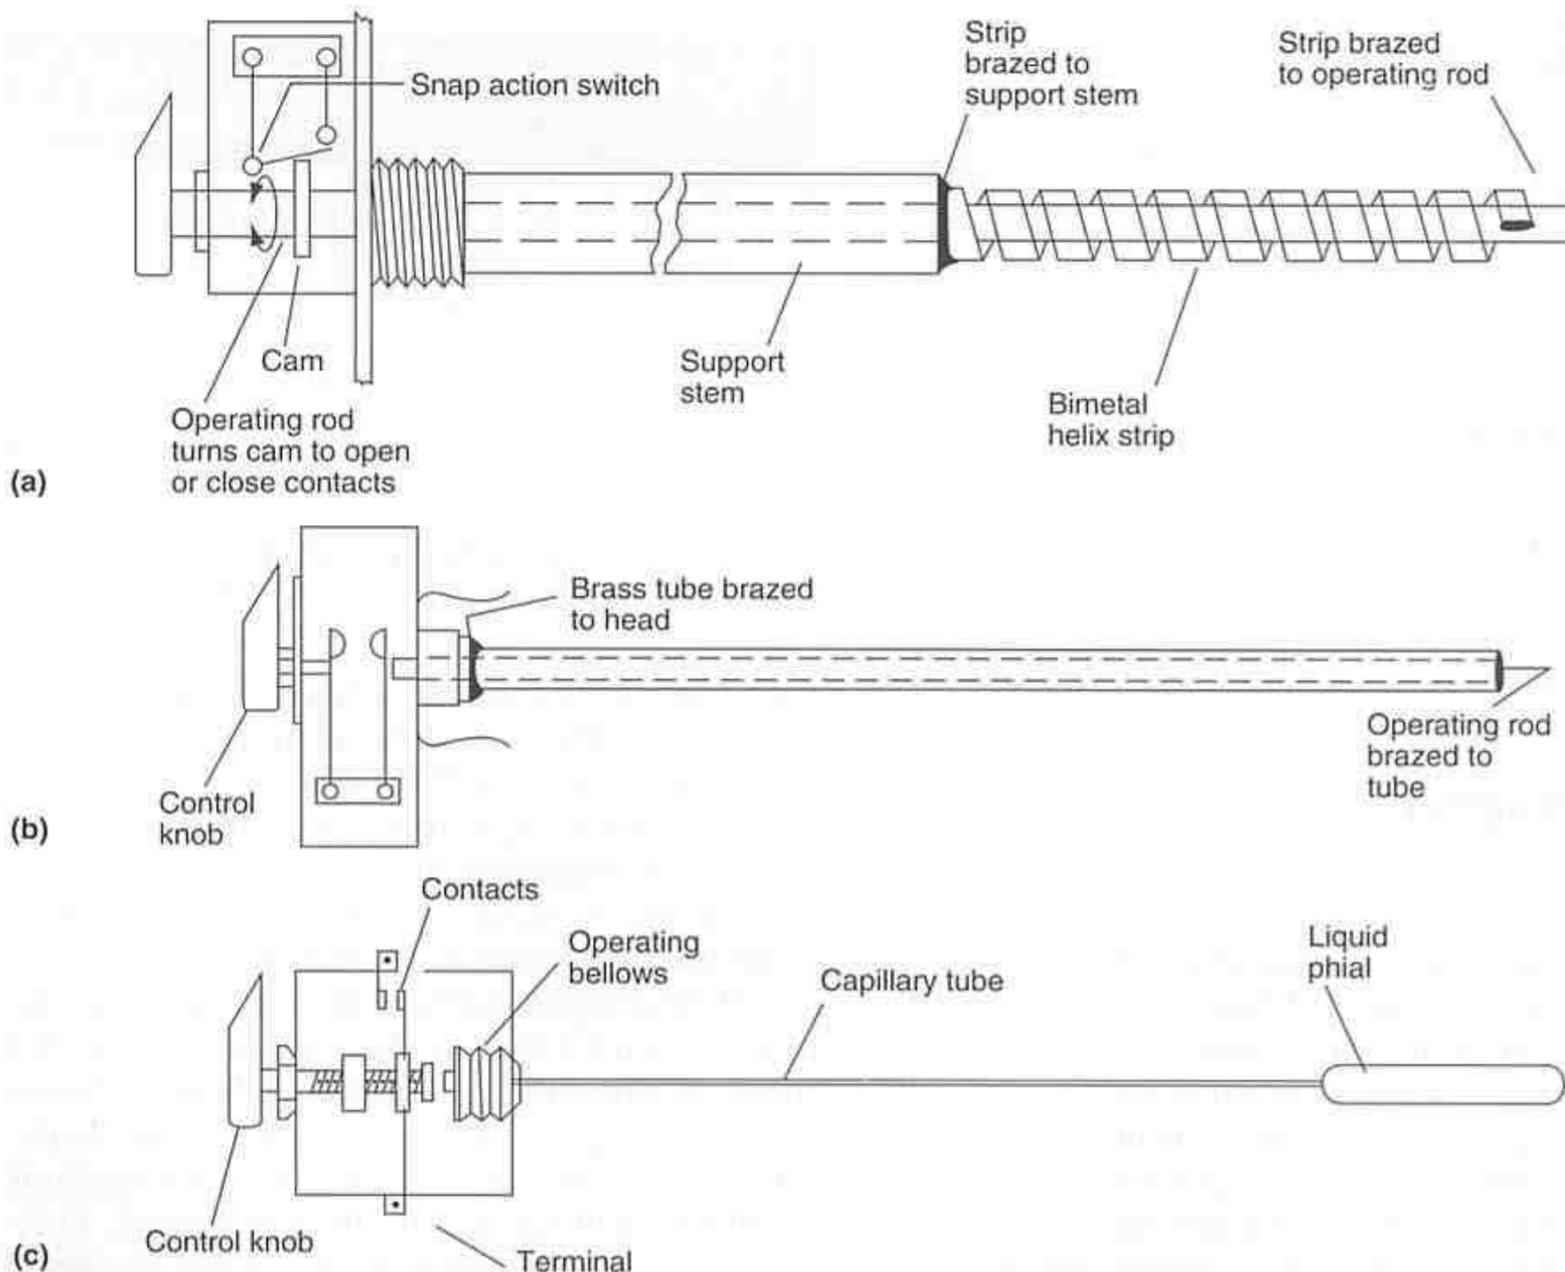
Principles of typical thermostat types: (a) bimetal; (b) expanding tube; (c) vapour pressure
